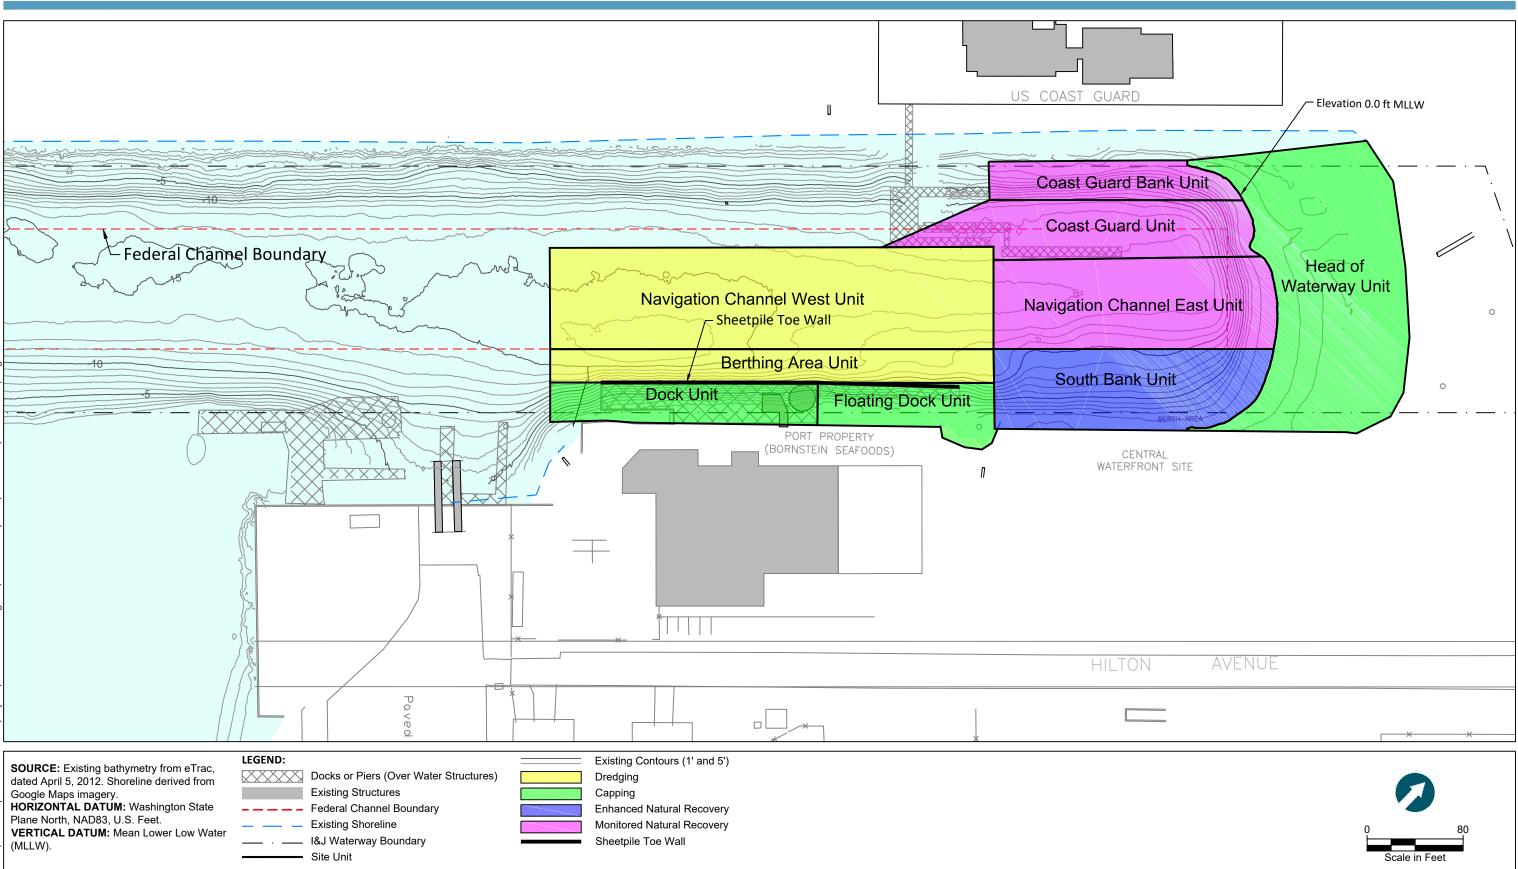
Alternative 3 Cleanup Action Plan I & J Waterway Site Port of Bellingham
